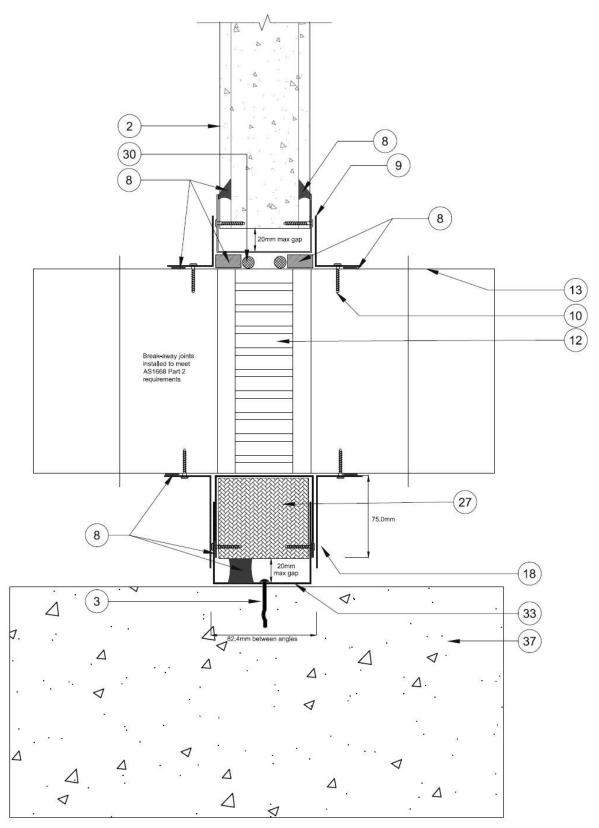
Kilargo Damper installation 75mm-95mm from base of wall
